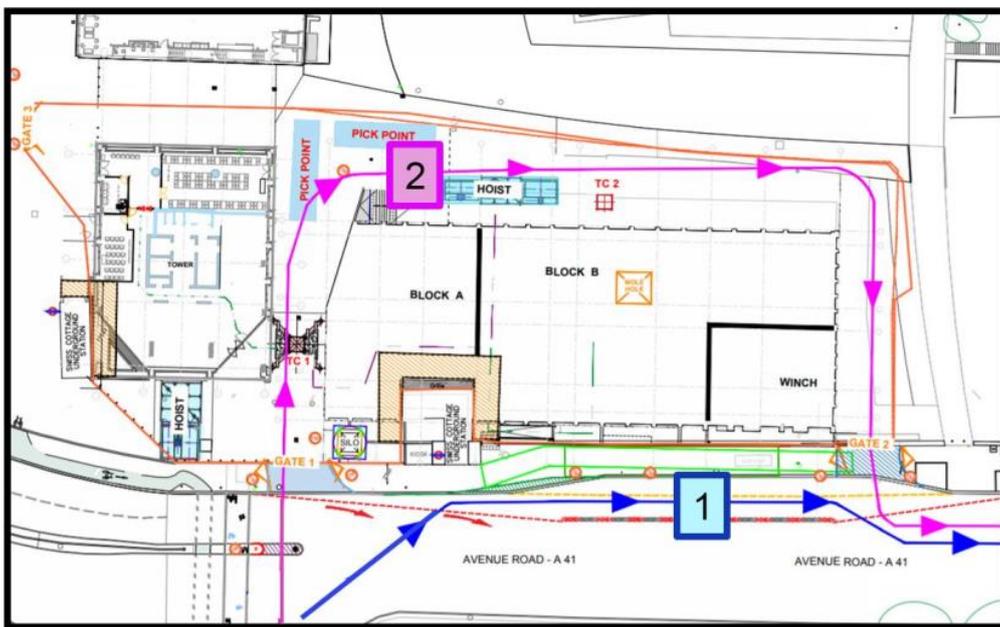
(above): Proposed site plan showing vehicle routes within the Amended CMP.
